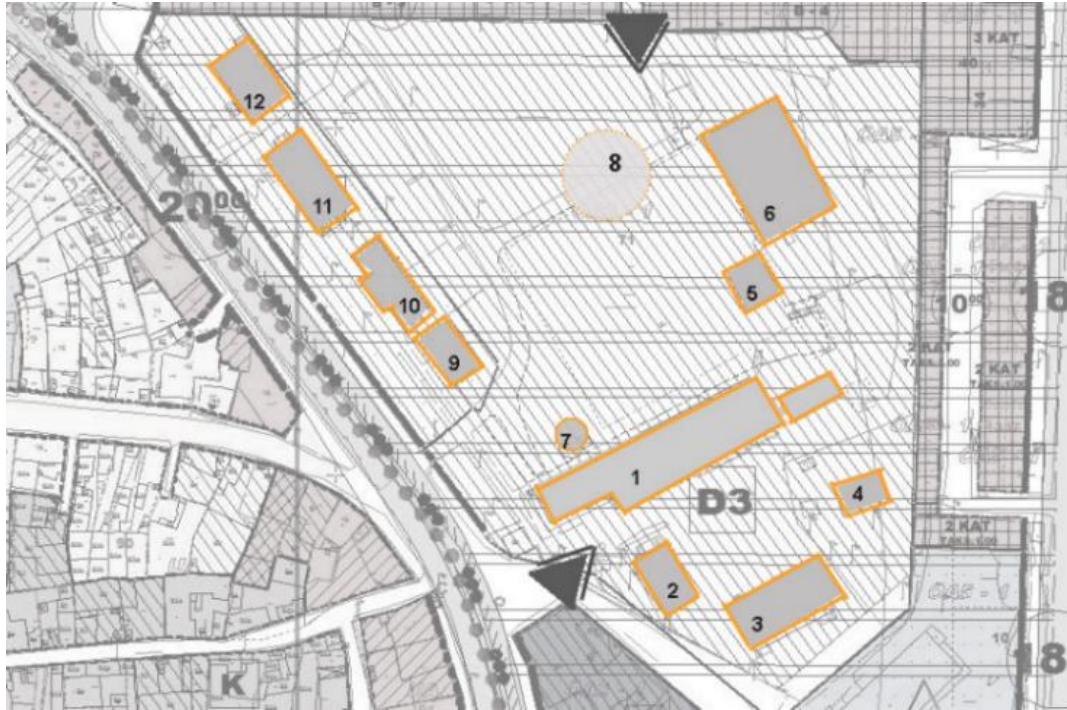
Site Plan of the Ürgüp Tekel Factory (Site Plan was developed from Ürgüp Municipality).
